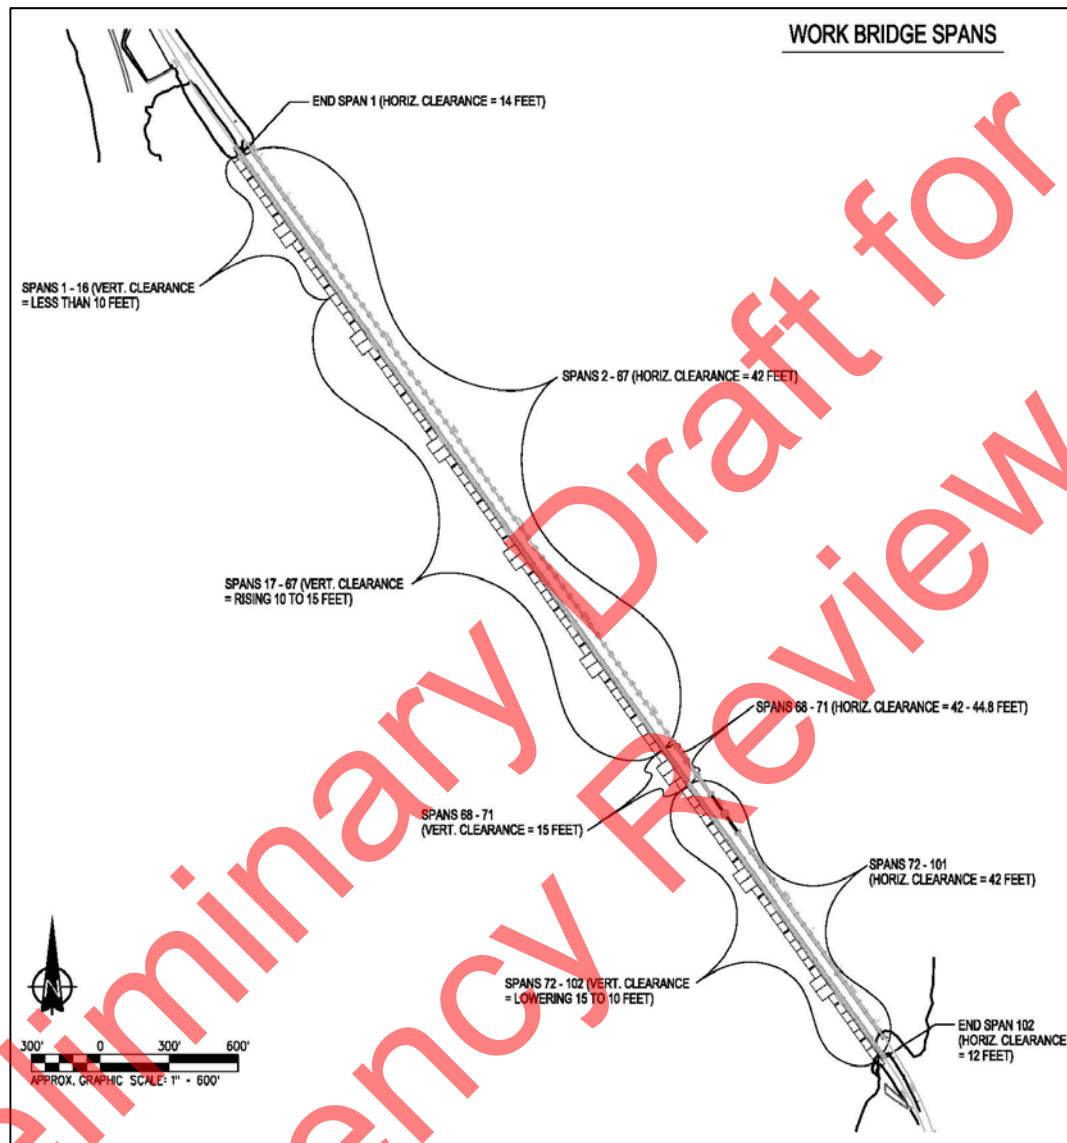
Bridge 3.9 Work Bridge Spans (Temporary)
